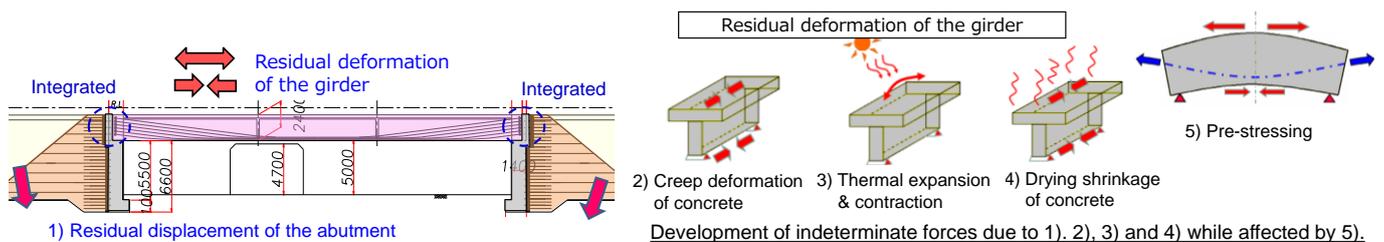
Several potential problems with long span PC girders of GRS integral bridge.
